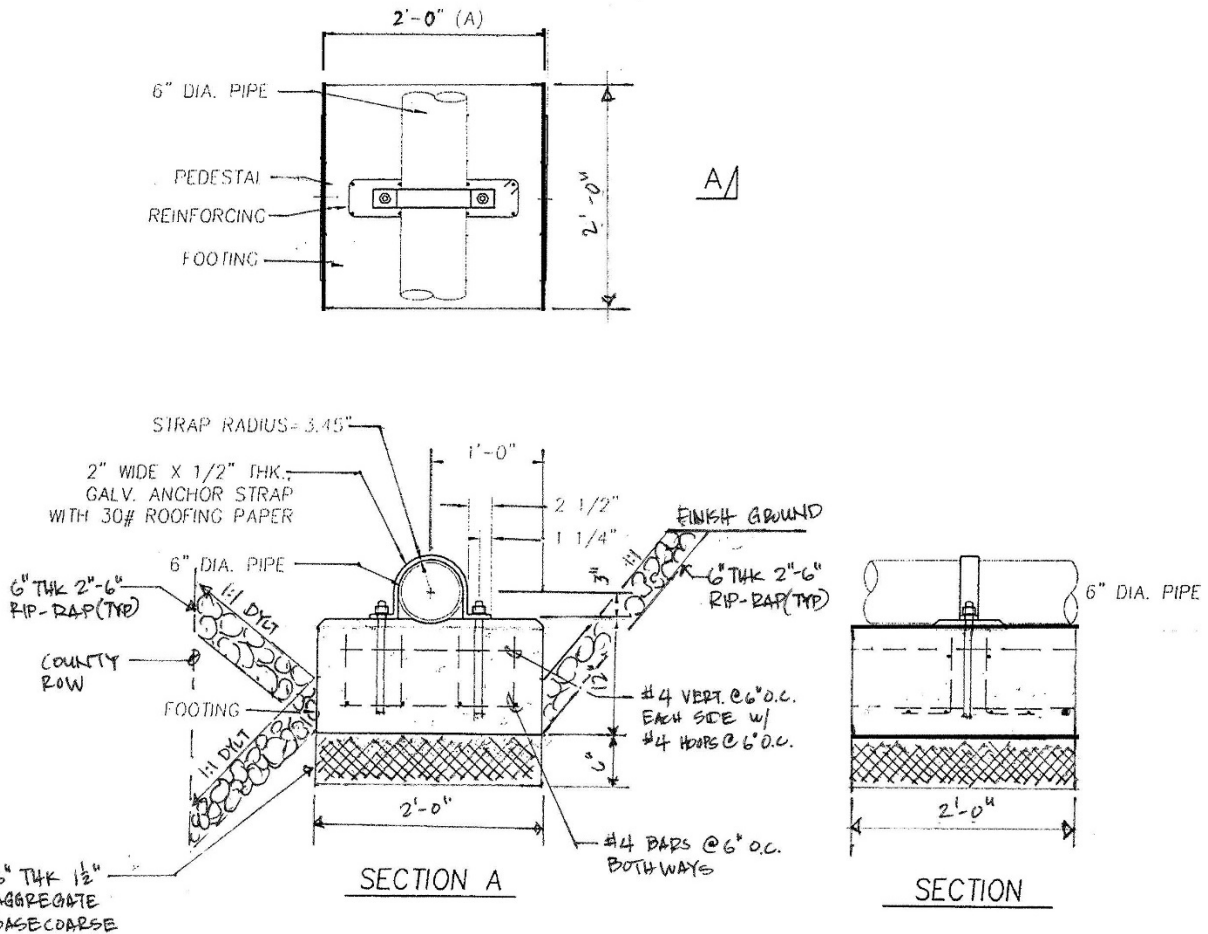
Typical Section for Water Line Installation in V-Shaped Riprap Trench
